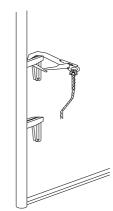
Fixing point in frame corner Fig. 8-2: Fixing point over scaffold box (outside and inside of scaffold)
